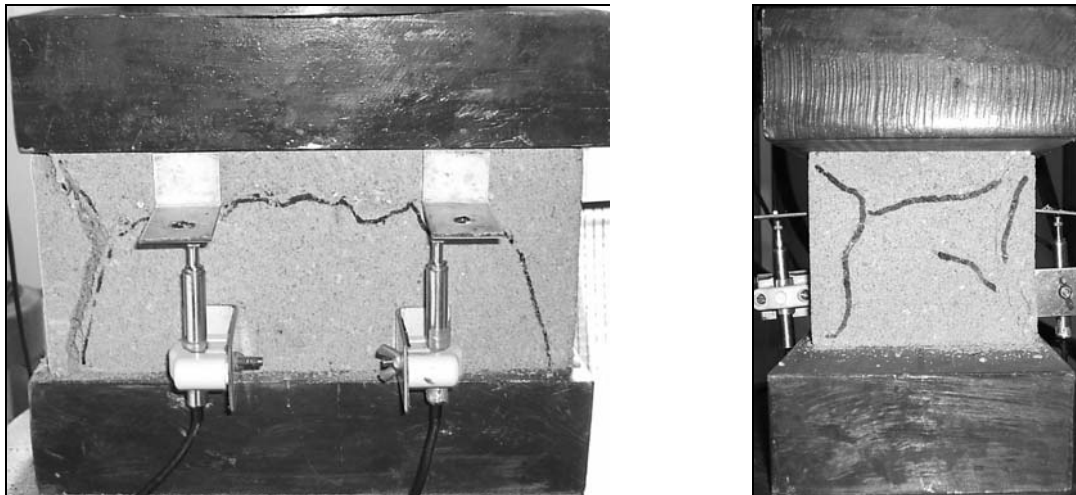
Horizontal cracks connecting vertical cracks.
